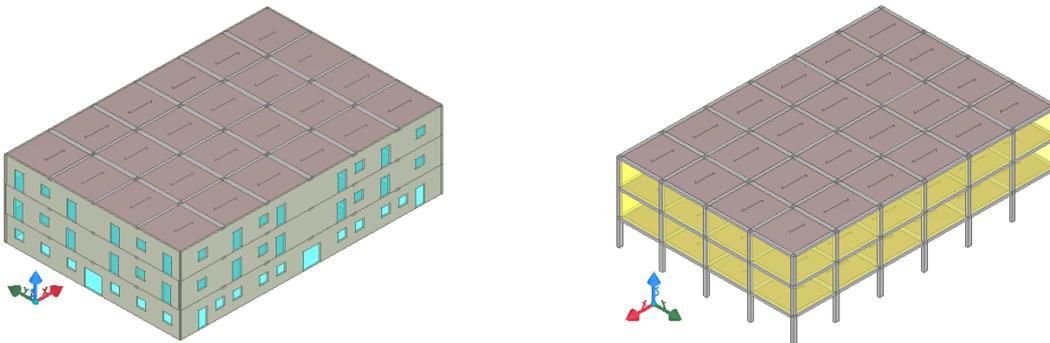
3D model of the building: a) with walls; b) with frames.
